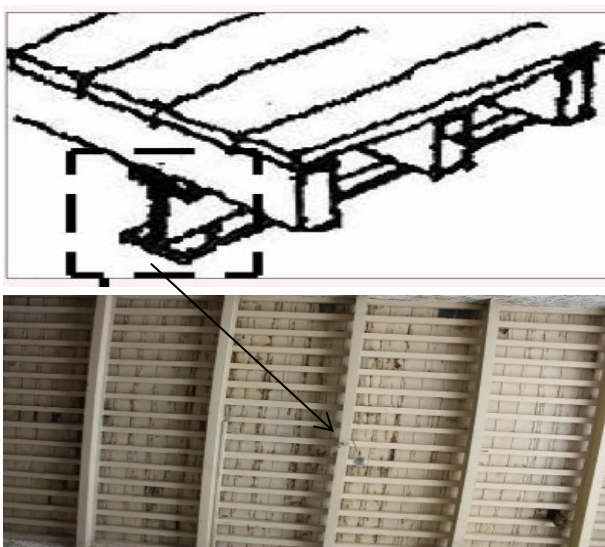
The construction of intermediate ceiling after 1880s when I-beam started to appear (idem).
